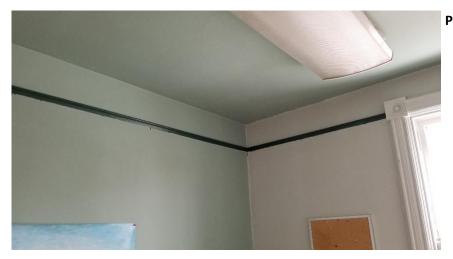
View of leadcontaining light green paint observed on the wall in Room 206.
